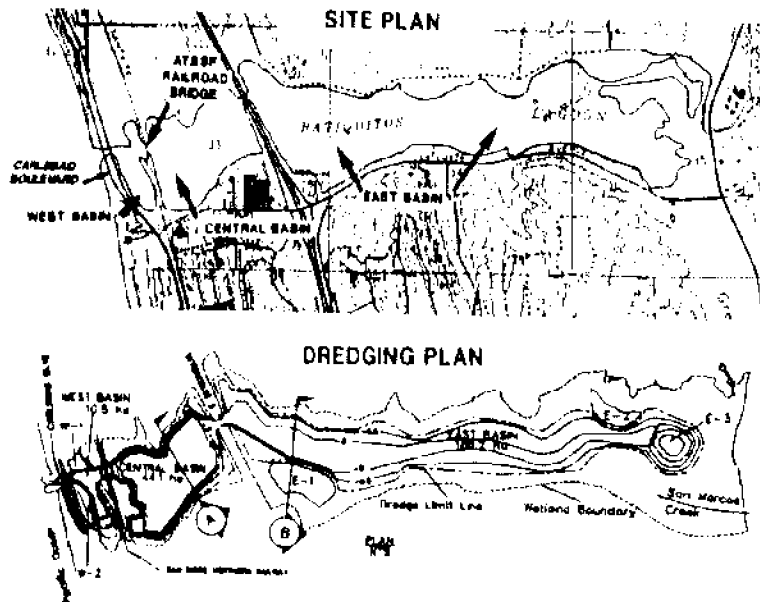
Batiqitos Lagoon Site Plan and Dredging Plan
